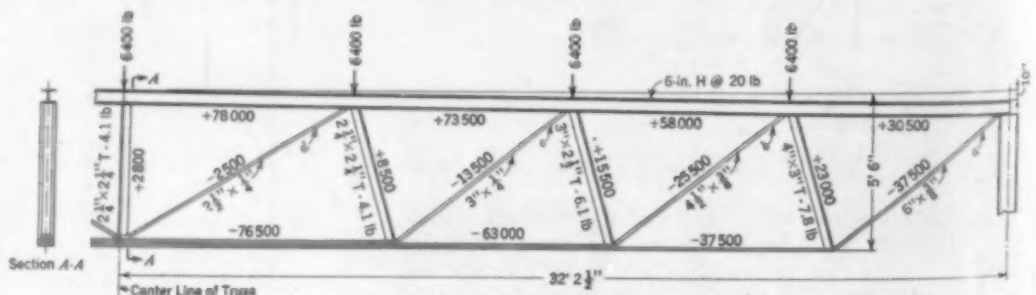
DESIGN OF A WELDED ROOF TRUSS, 64 FT 6 IN. LONG, AT MANSFIELD, OHIO
